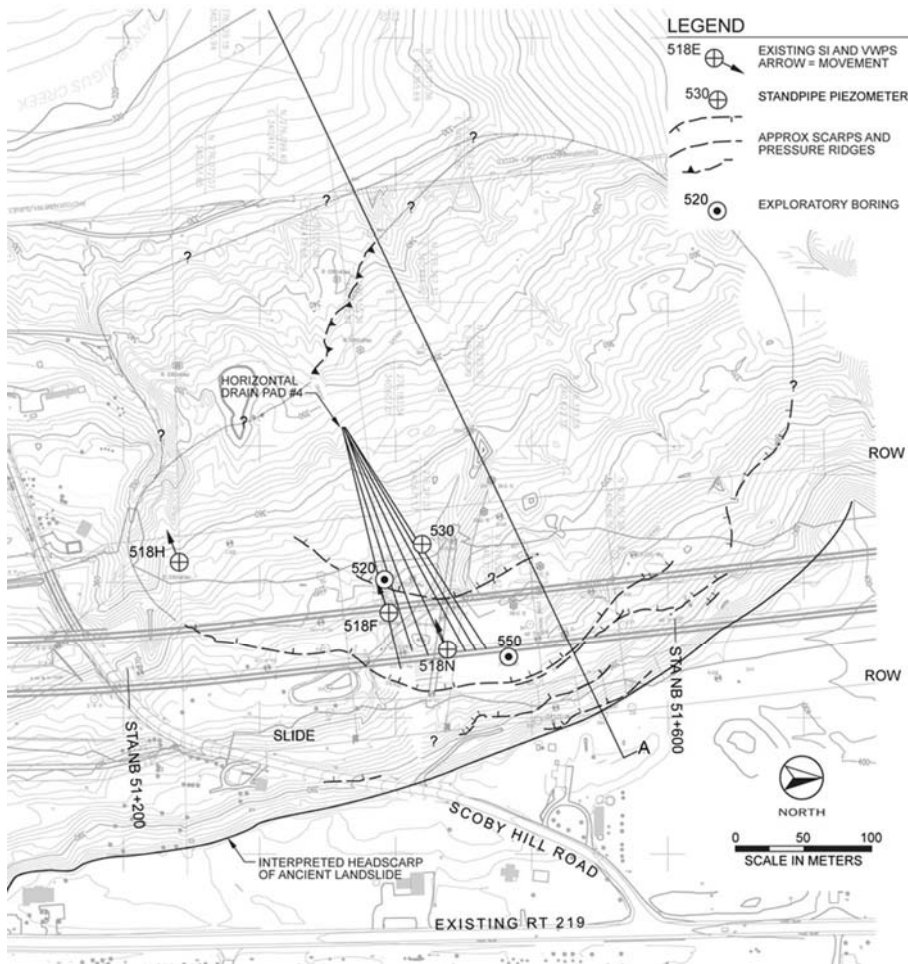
Site Plan – Test Horizontal Drains at Pad 4.
